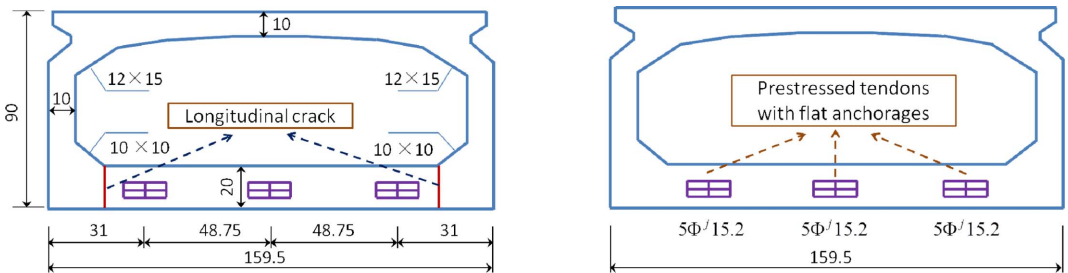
Anchor end section of void slab girders in Jinhua National road bridges (unit: cm)
